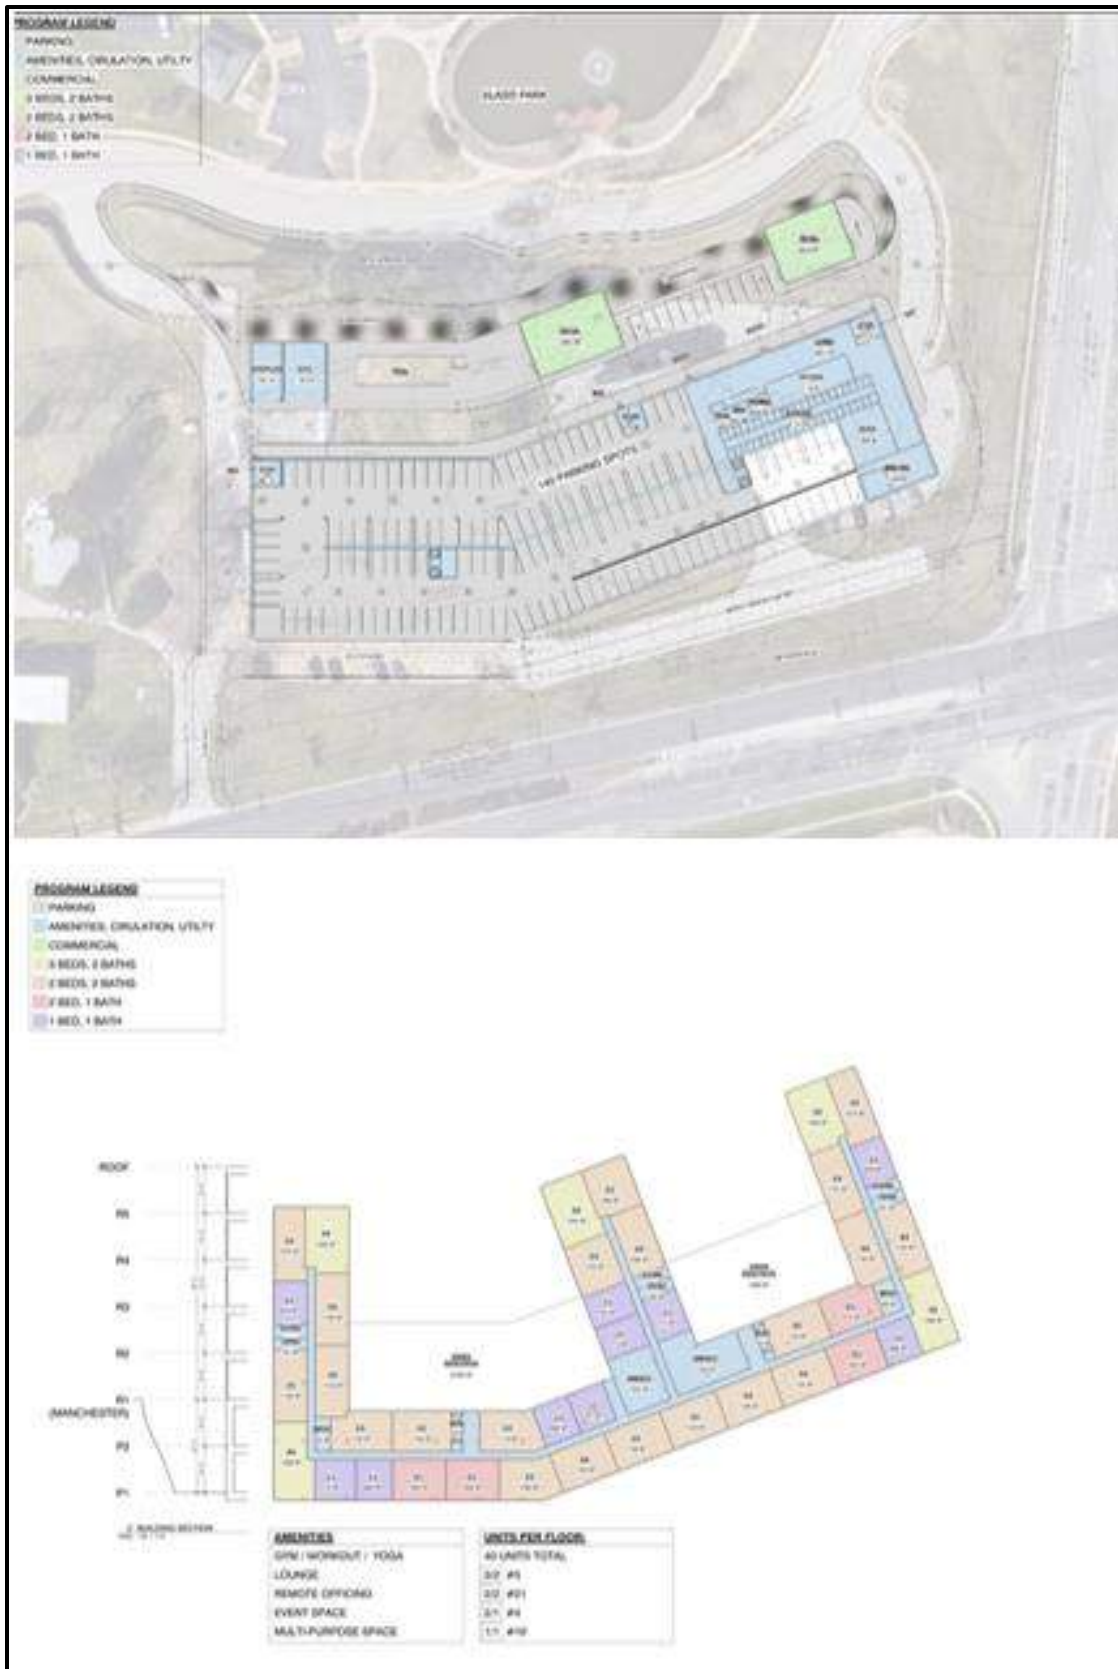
Proposed Park Place at Vlasis Site Plan (provided by others)
